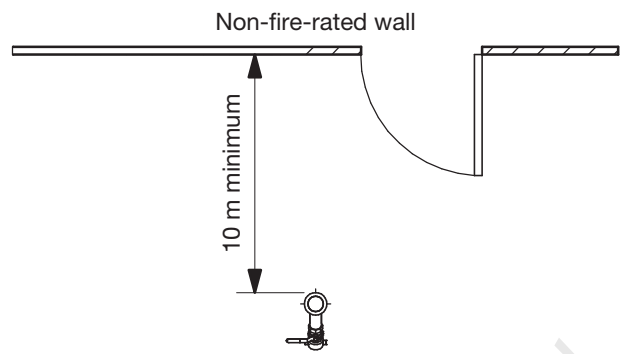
Unsprinklered building – Hydrant outlet protection – Separation distance option – Plan view
